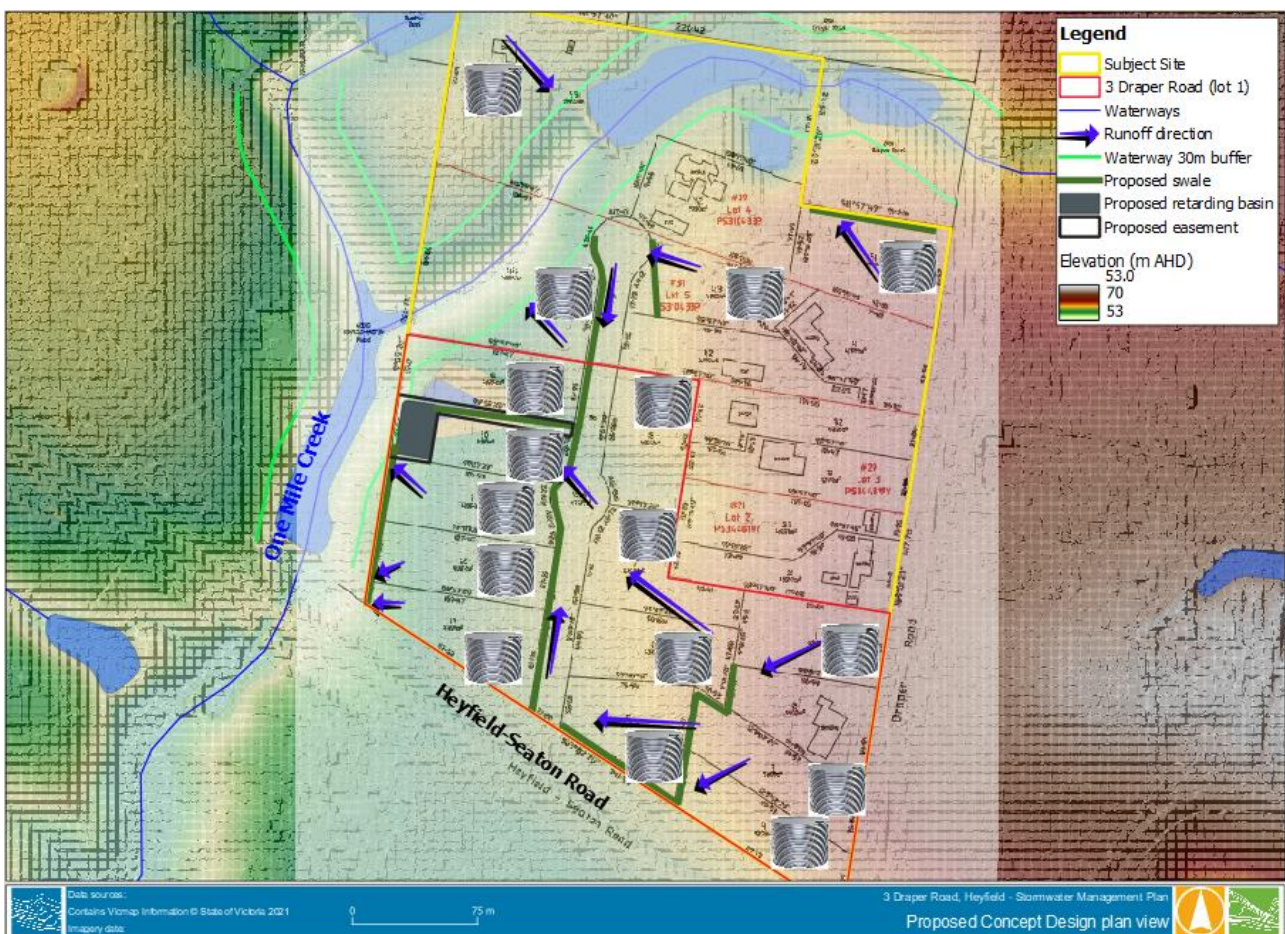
Rainwater Tanks/Swales and Retarding Basin Proposed Concept Design - plan view
